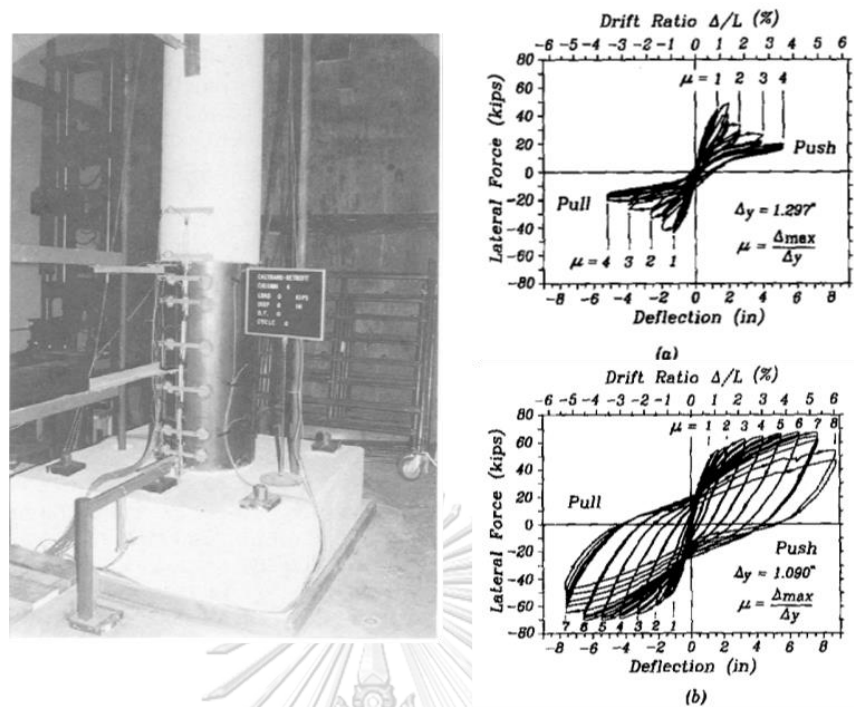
Steel jacket circular bridge column and the hysteresis response of as-built and retrofitted circular columns [26]
